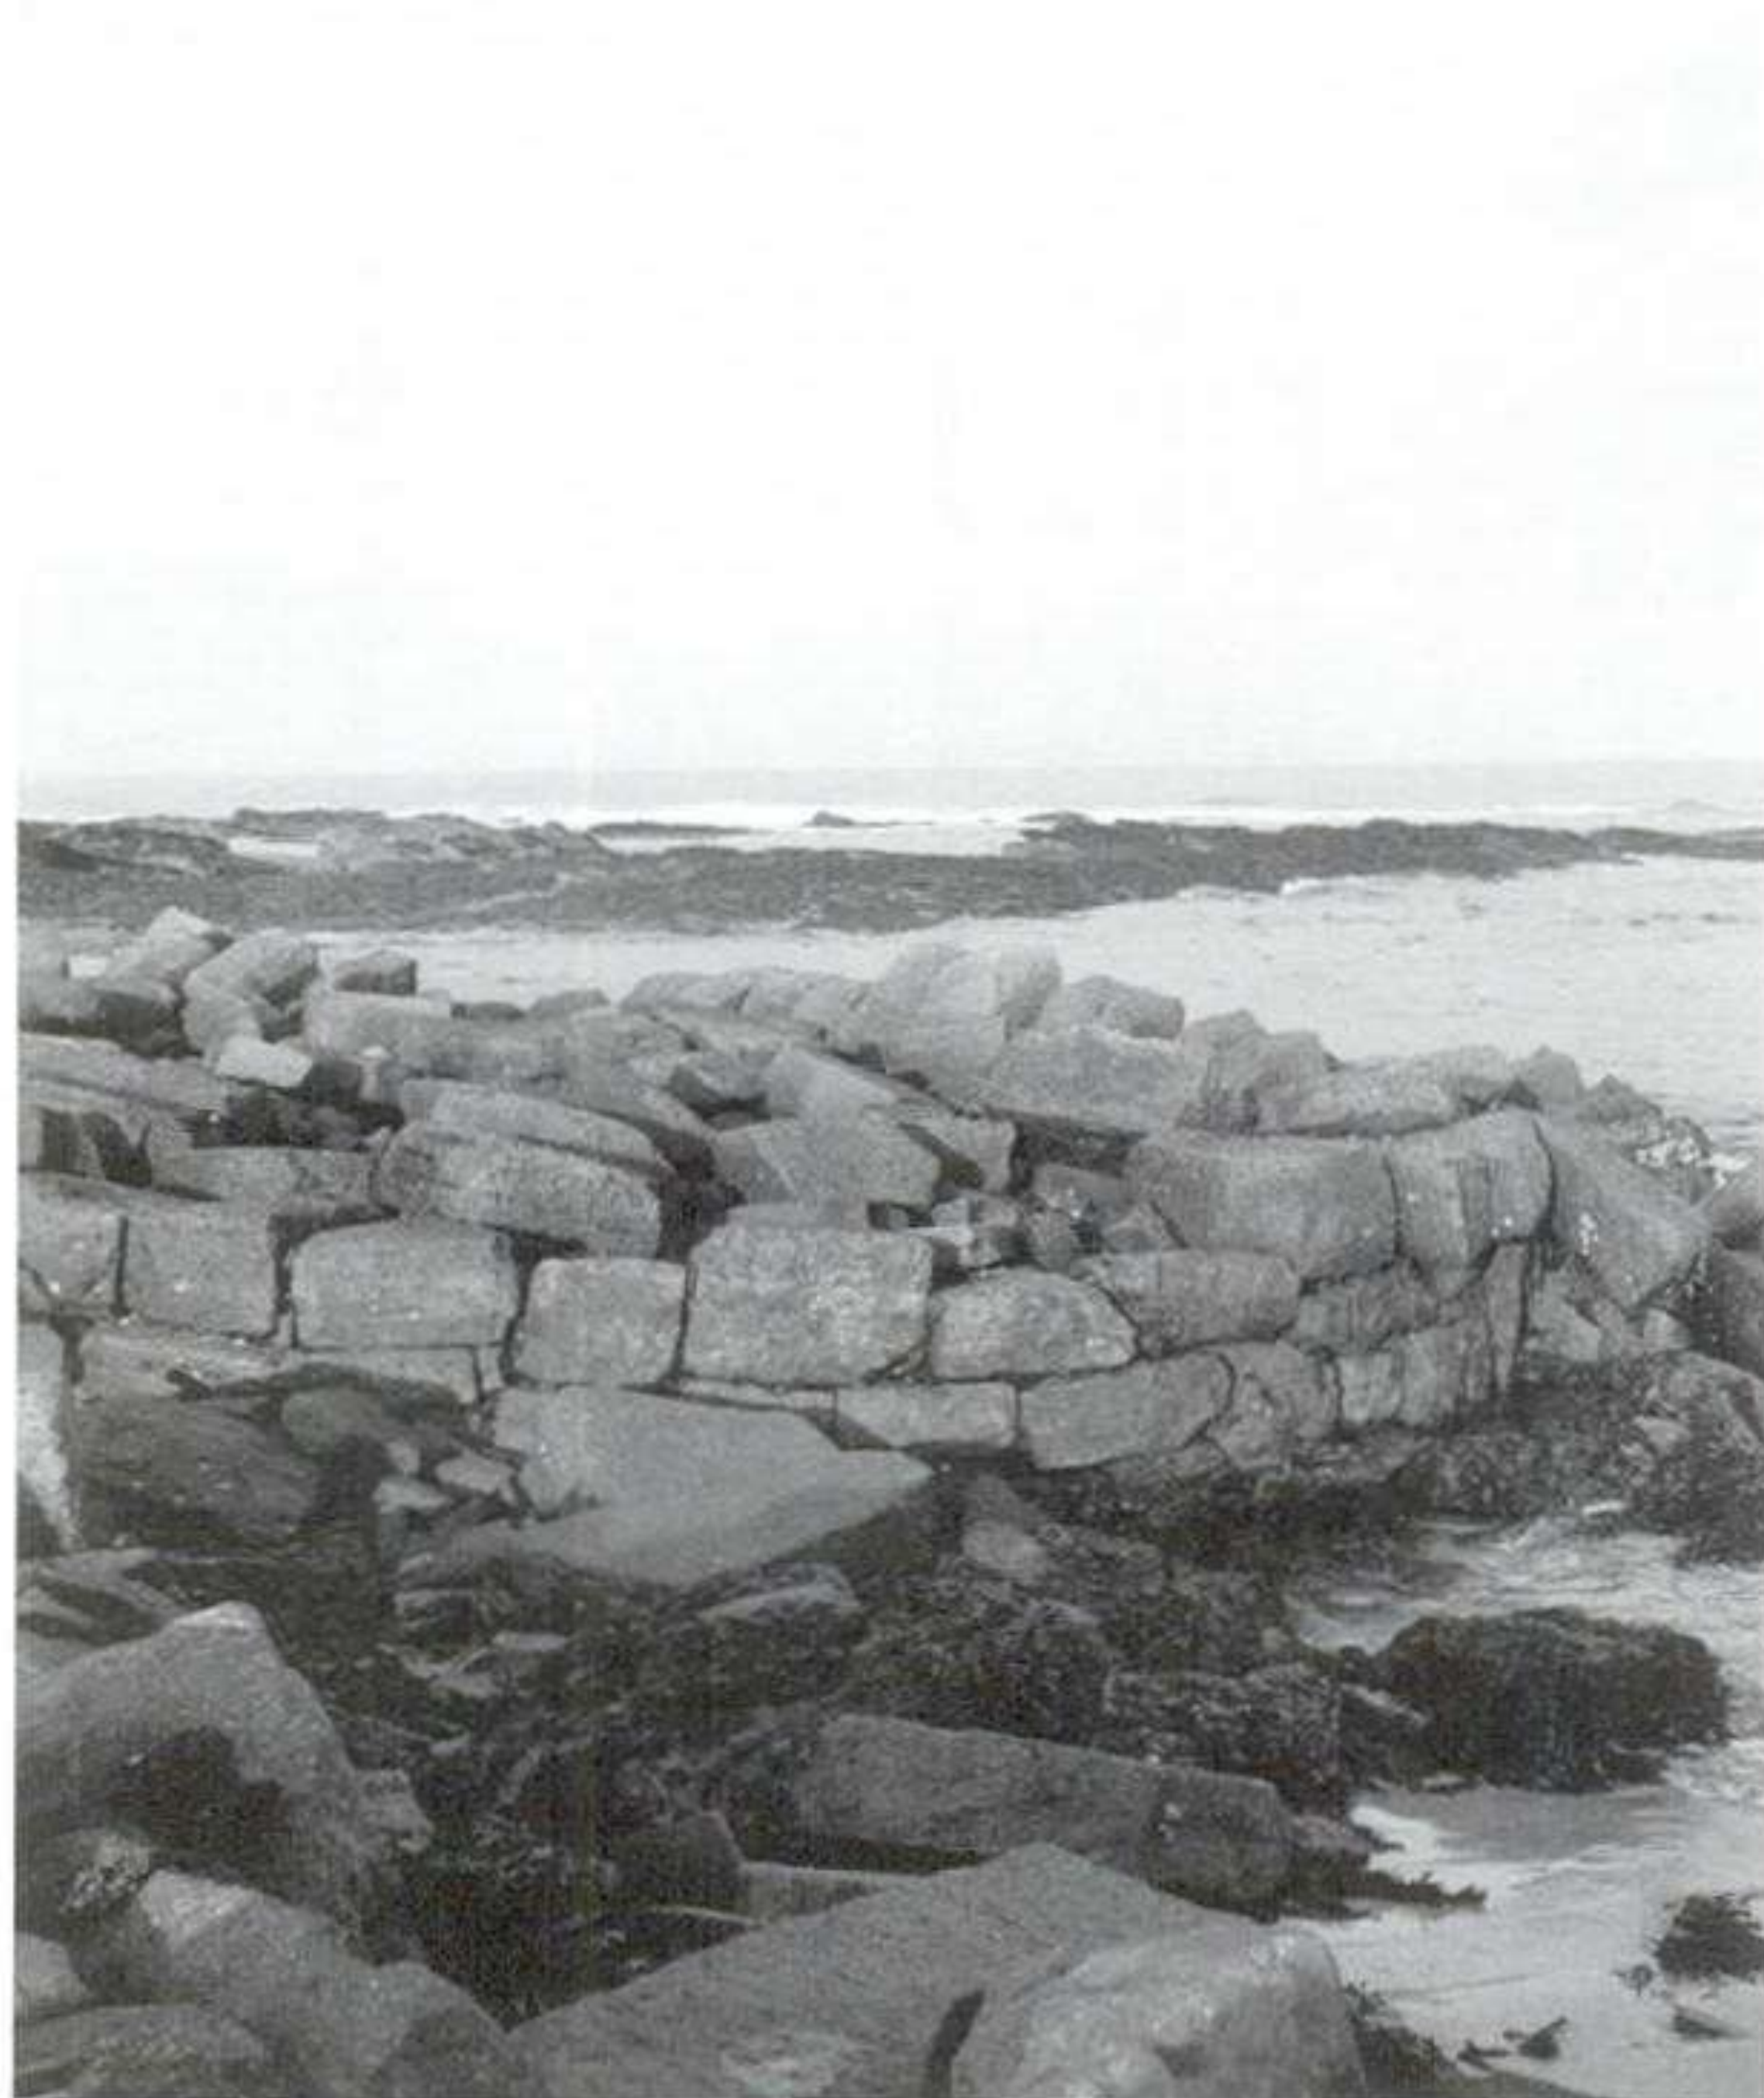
Footings of the collapsed north west pier of Kingsbarns Harbour.
